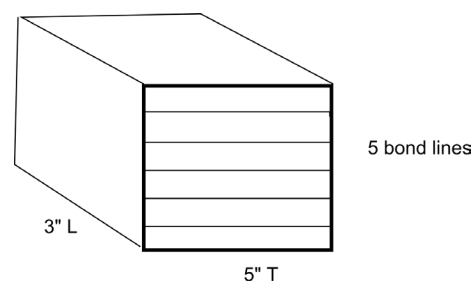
Size of cut vacuum-pressure soak specimen that was tested for delamination (3 in. = 76.2 mm; 5 in. = 127 mm).
